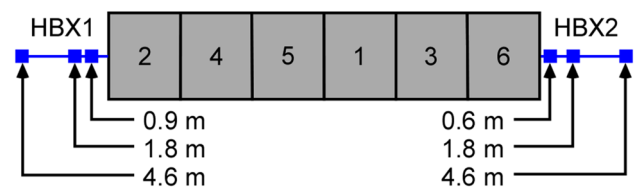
Horizontal extensometers (HBX1 and HBX2) installed in the west and east abutments, respectively
